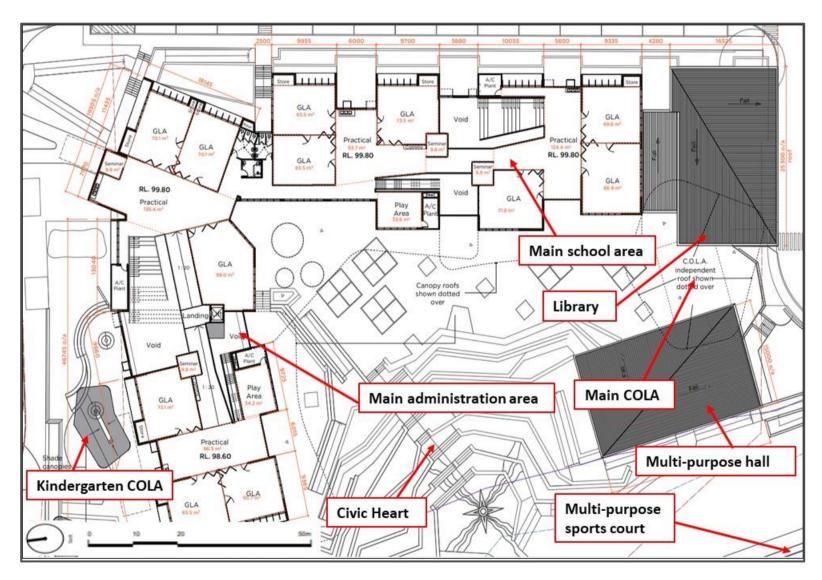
| First floor building layout and orientation (Source: Applicant's EIS 2018)
